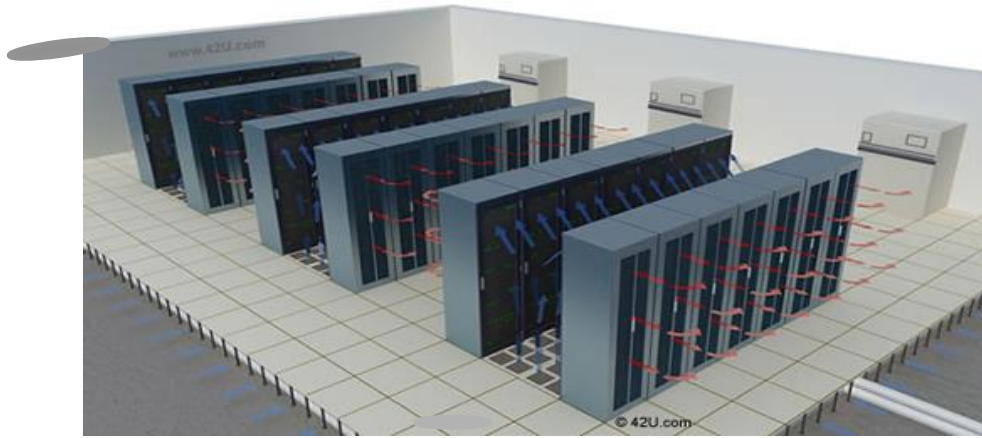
“Cold Aisle” configuration for Under Floor Air Delivery (UFAD)
